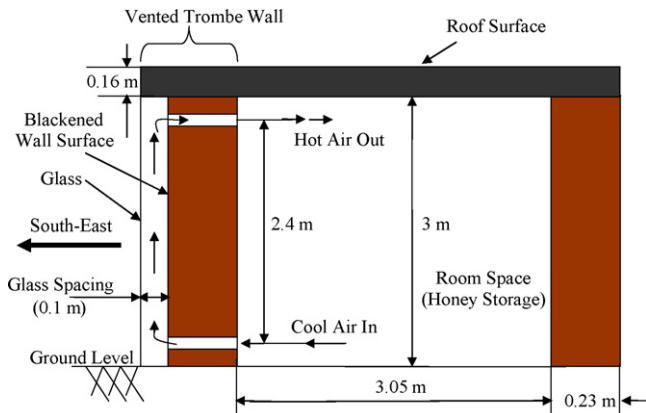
Vented Trombe wall retrofitted on the south-east wall of size (5 m × 3 m).
